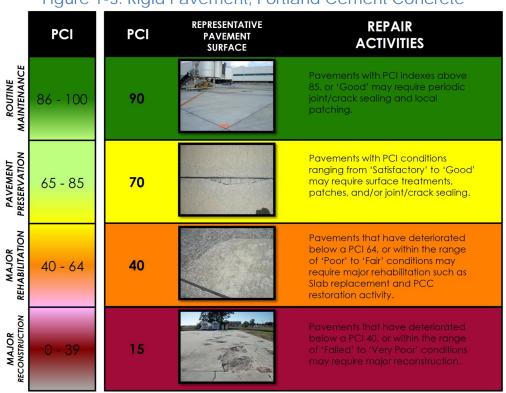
Rigid Pavement, Portland Cement Concrete
